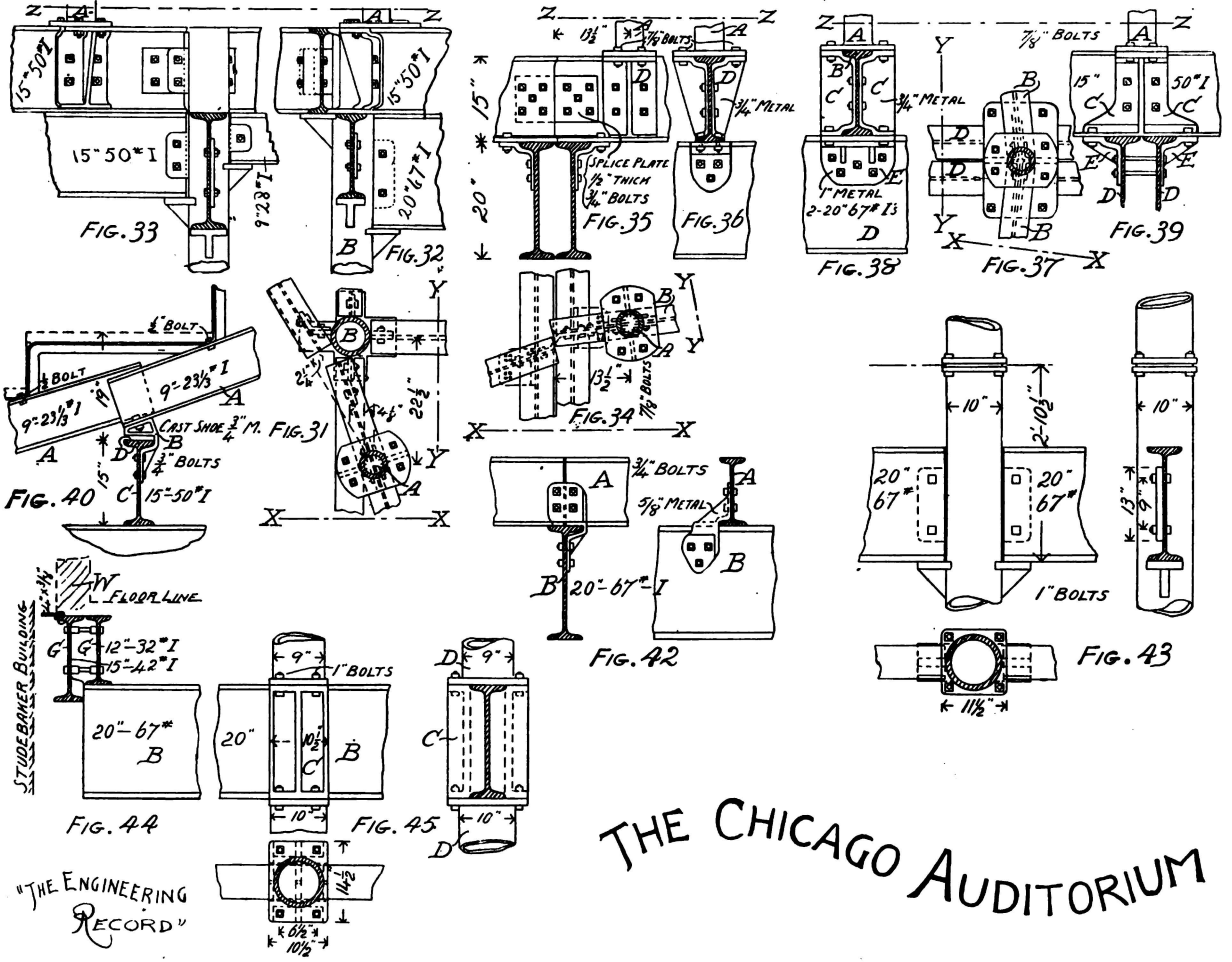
to 39, inclusive, show connections of the parquet beams and columns.
